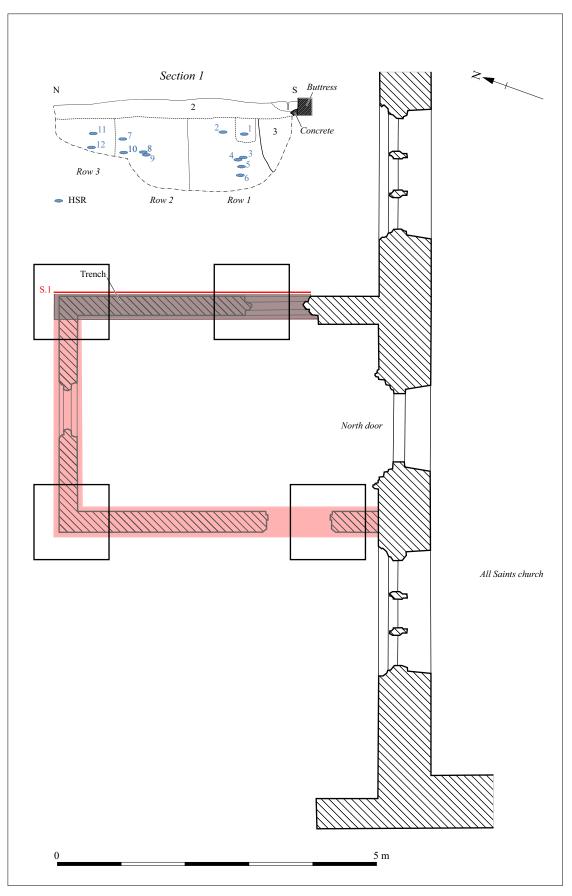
Plan and section of proposed new north porch (red) with archaeological trench (grey fill) and pile pits (black outline)
